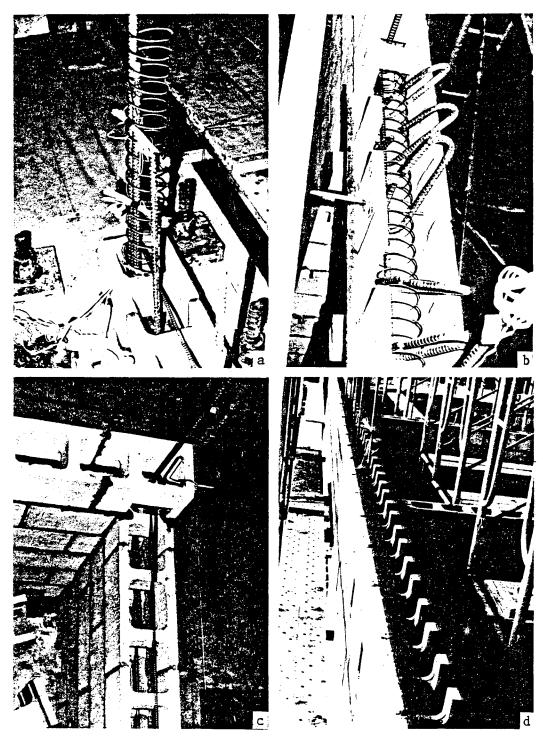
Construction Details a)Spirals in Walls b)Spirals in Bond Beams c)L-Intersection d)Floor Level Course
